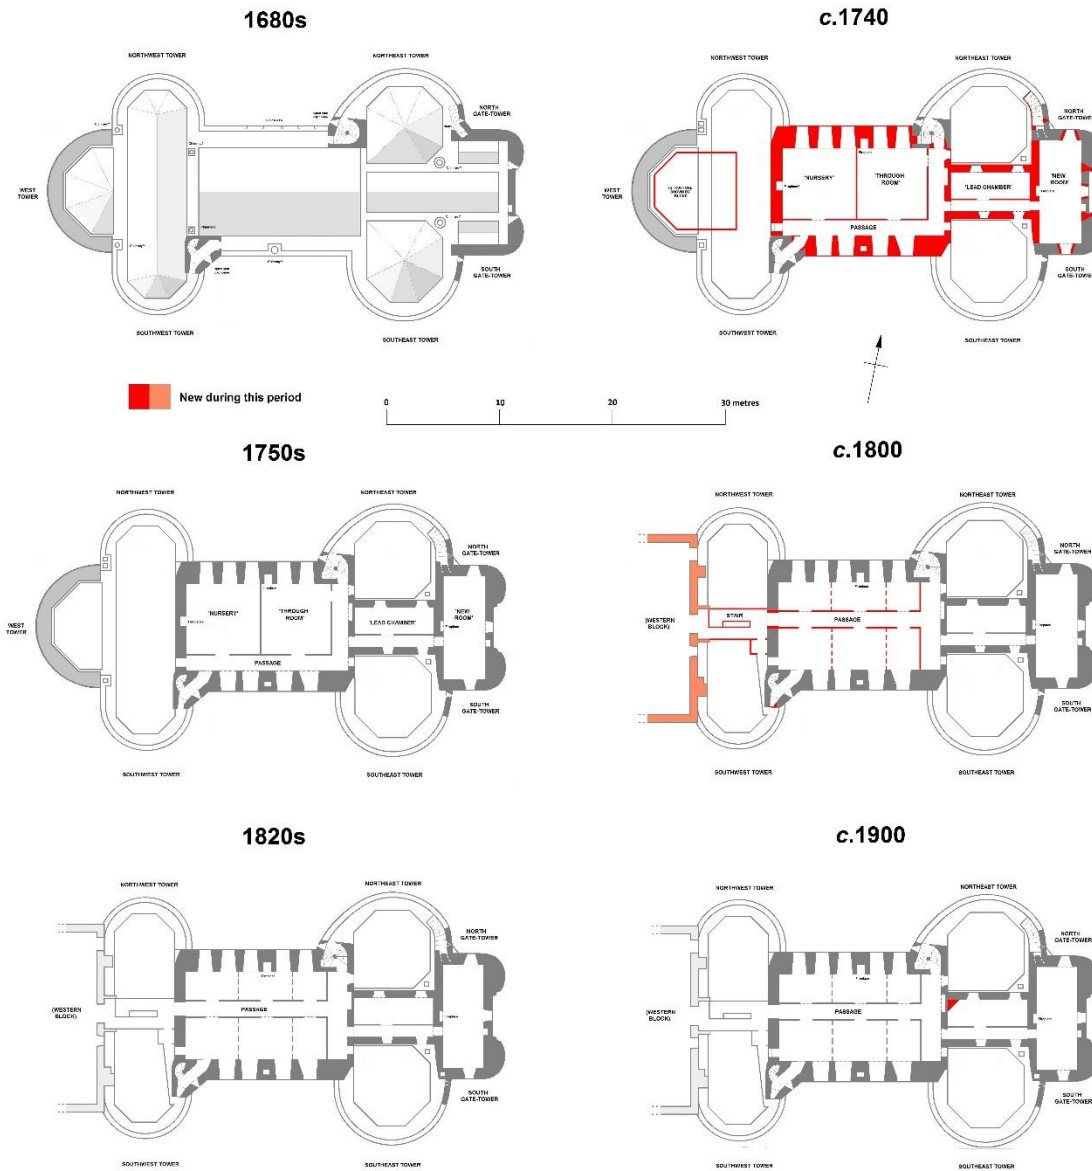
Second-floor plans of Picton Castle showing post-medieval development (1680s plan conjectural).
